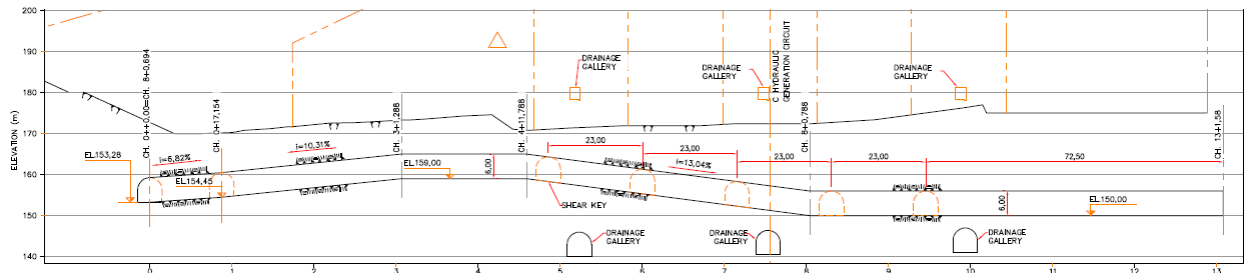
Shear keys and drainage galleries – Longitudinal Profile – Access to shear keys
